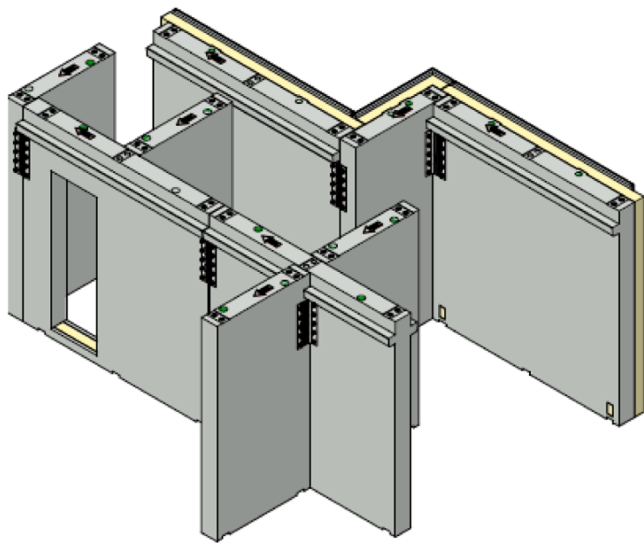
Typical horizontal joint configurations employing flat and angular multiple slit devices in precast wall panel structures.
